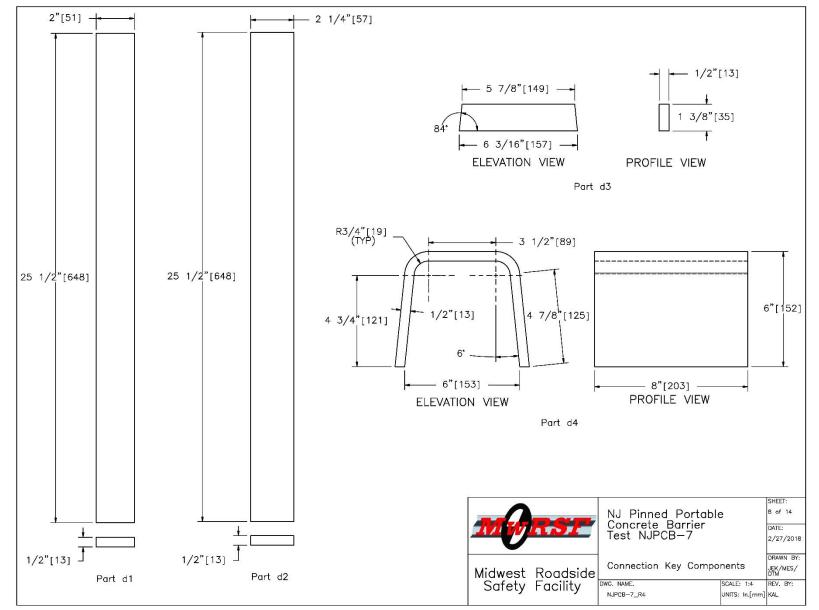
PCB Connection Key Component Details, Test No. NJPCB-7
